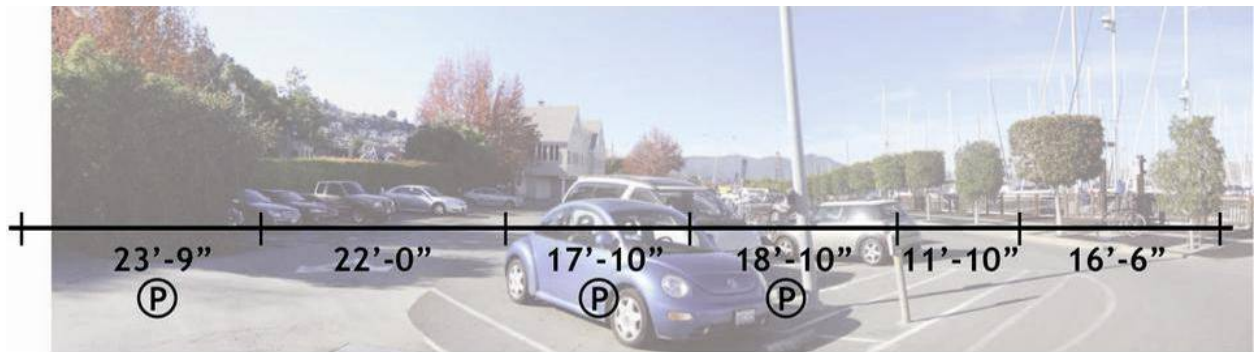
Segment 1E Parking Lot 4 South Existing Conditions
